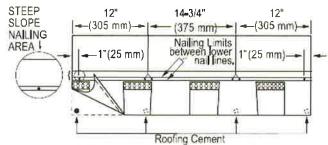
Use six nails and four spots of asphalt roofing cement on steep slopes.
